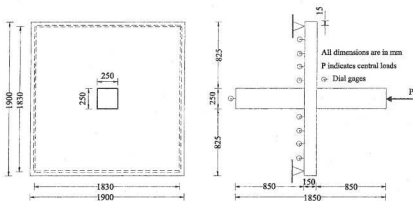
Layout of specimens with two column stubs and loaded centrally
